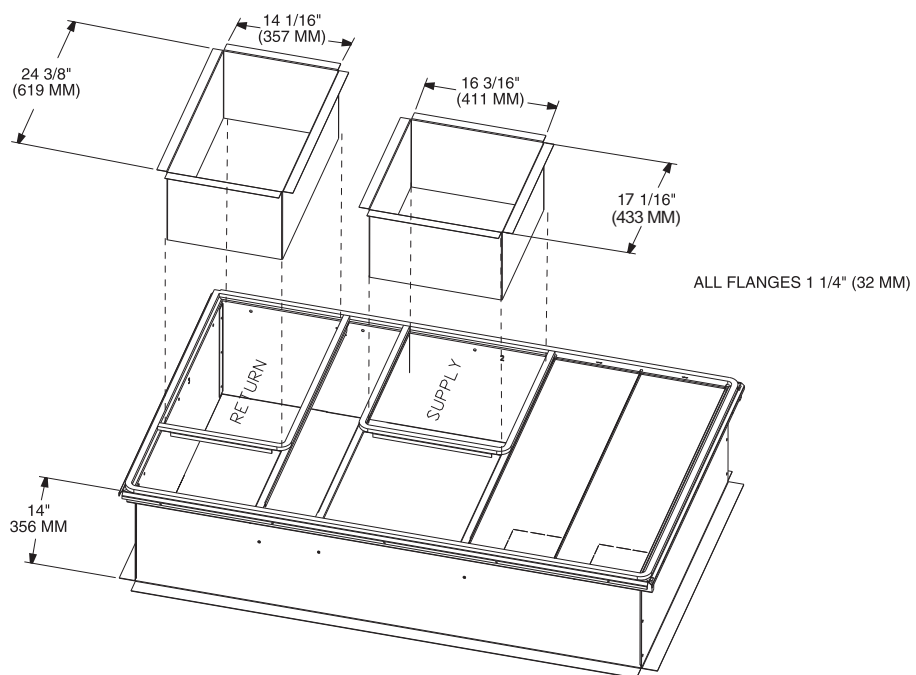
3 to 4 ton roofcurb - downflow duct connections
